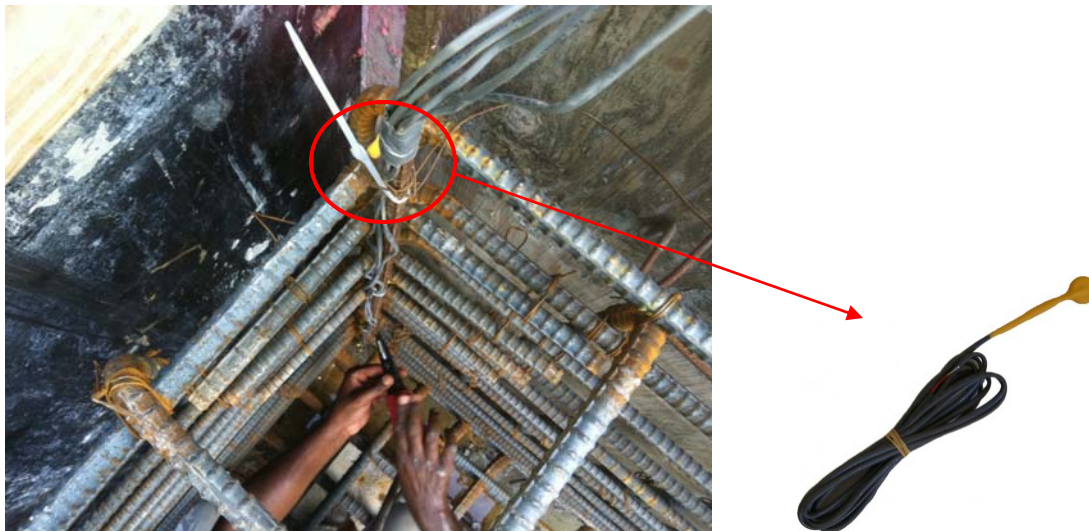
Data logger attached to reinforcing steel bar of footing.
